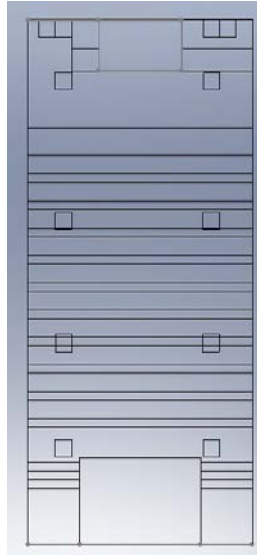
Layout plan for DK5 with diffusers and return air duct.
